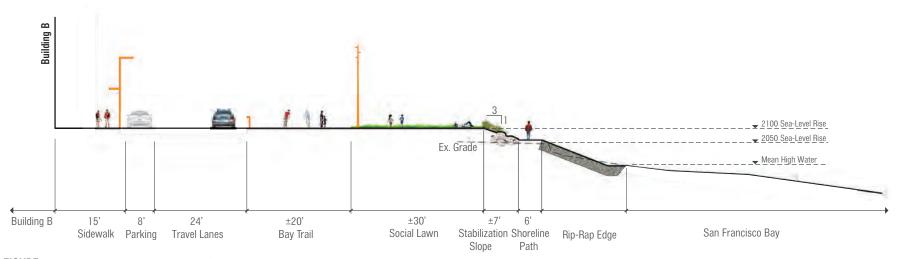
Illustrative Waterfront Terrace Section B-B
